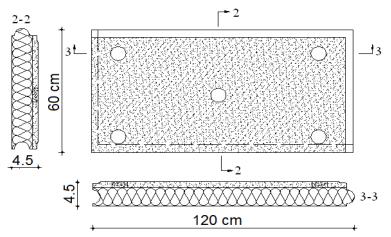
Prefabricated two-layer panel with cores for mounting and fixing.
